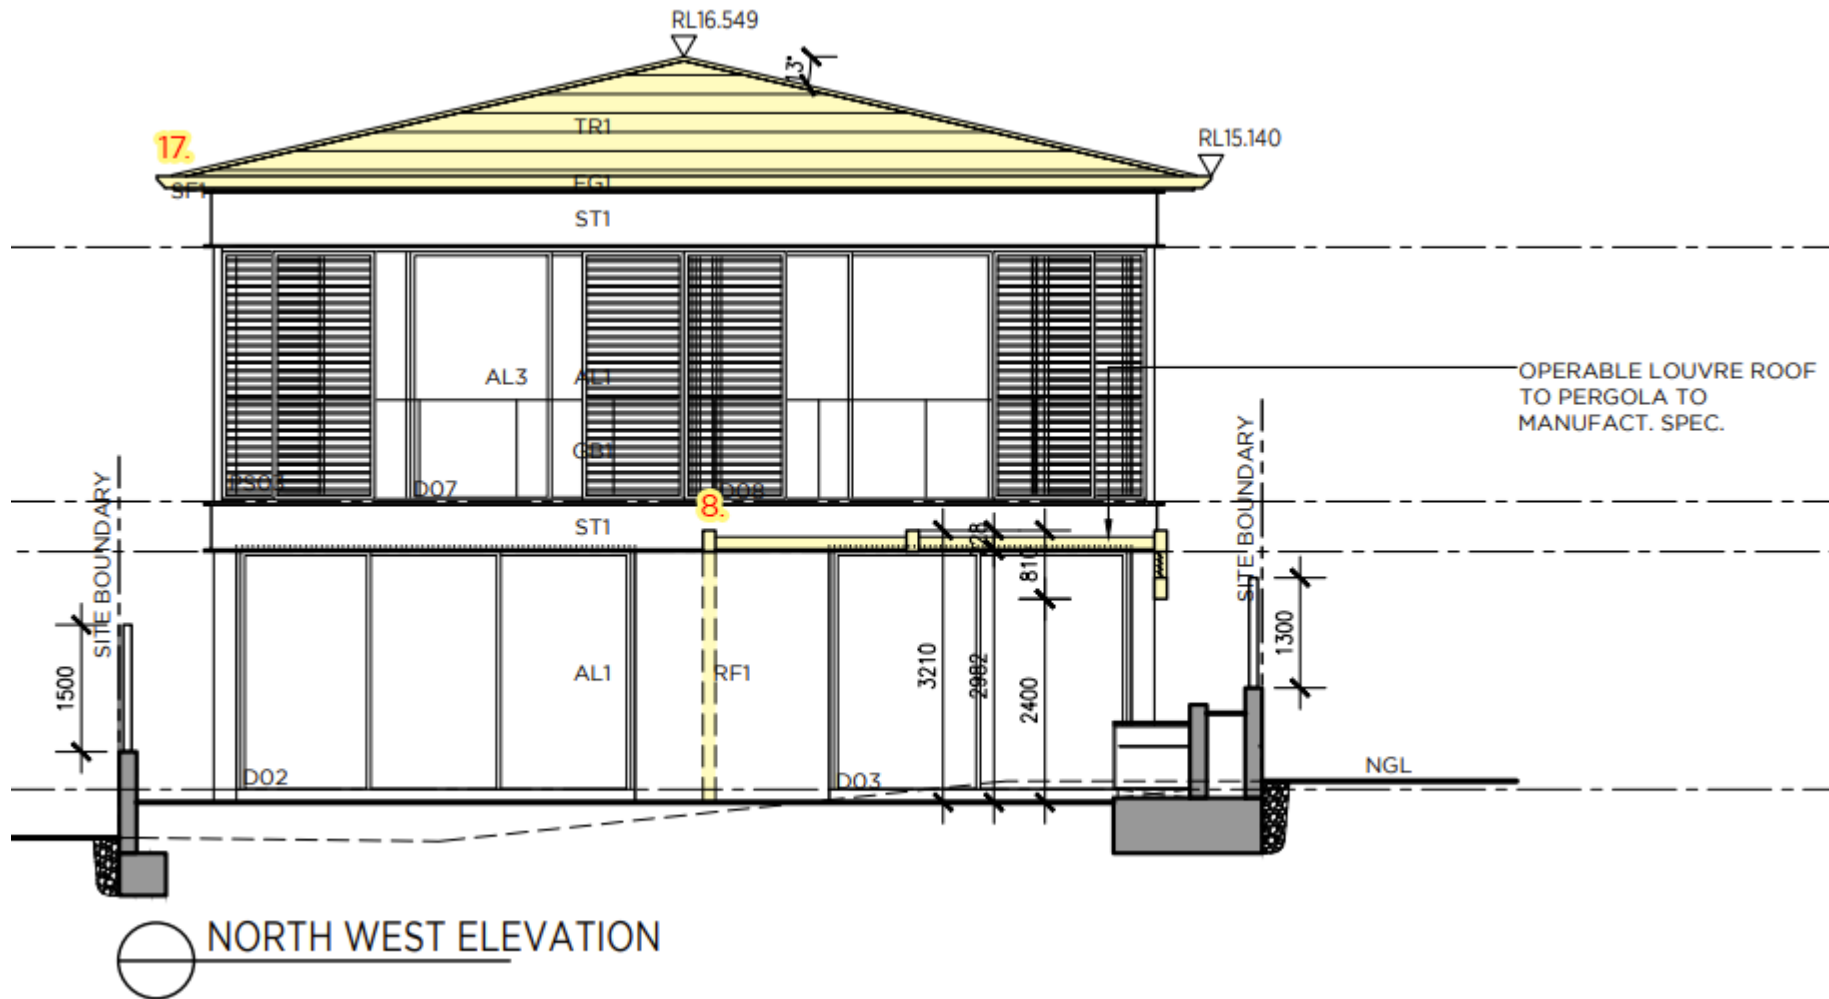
North West Elevation for S4.55(2) submission prepared by Alvaro Architects.
